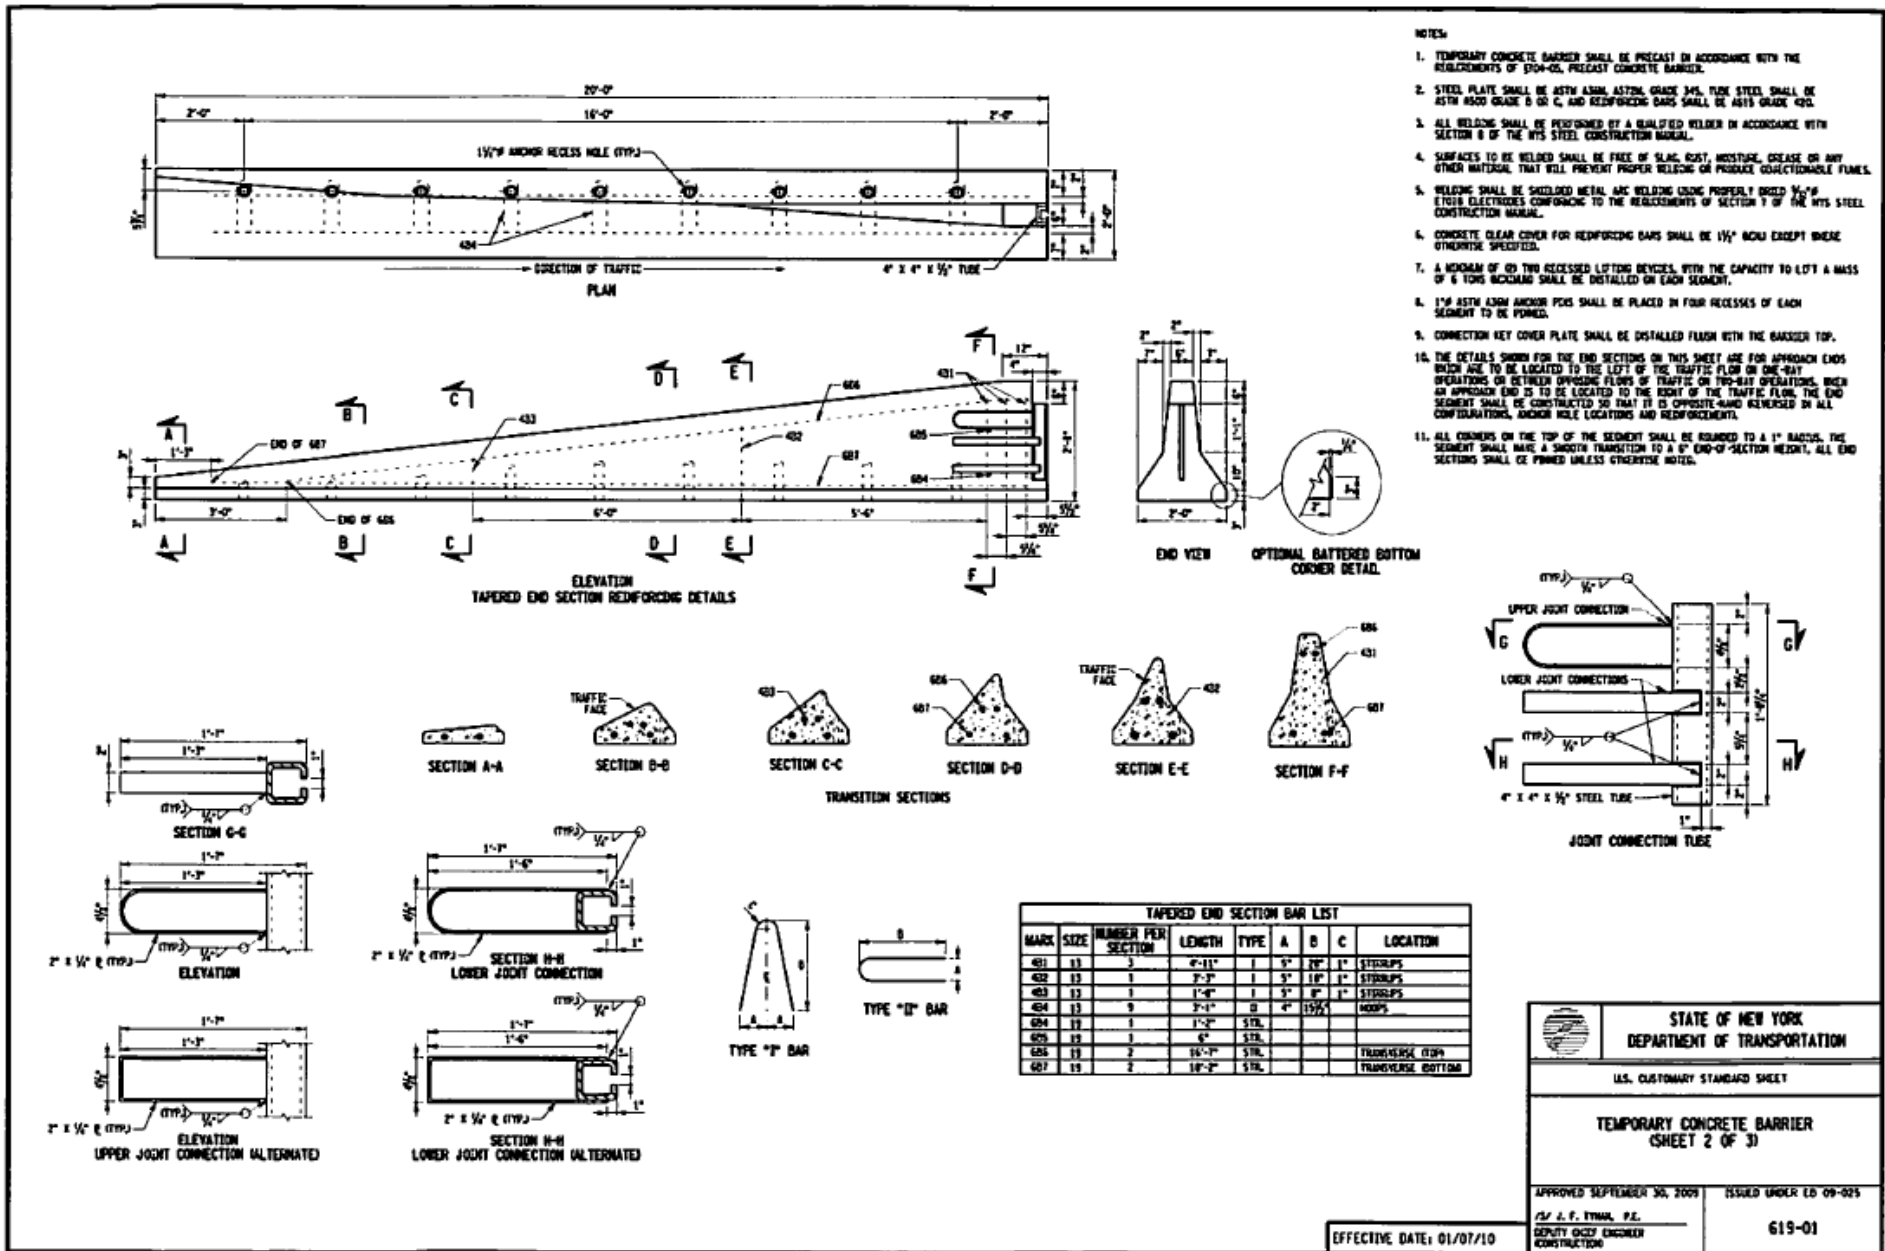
Cont'd. - Details of NYS Temporary Concrete Barrier
